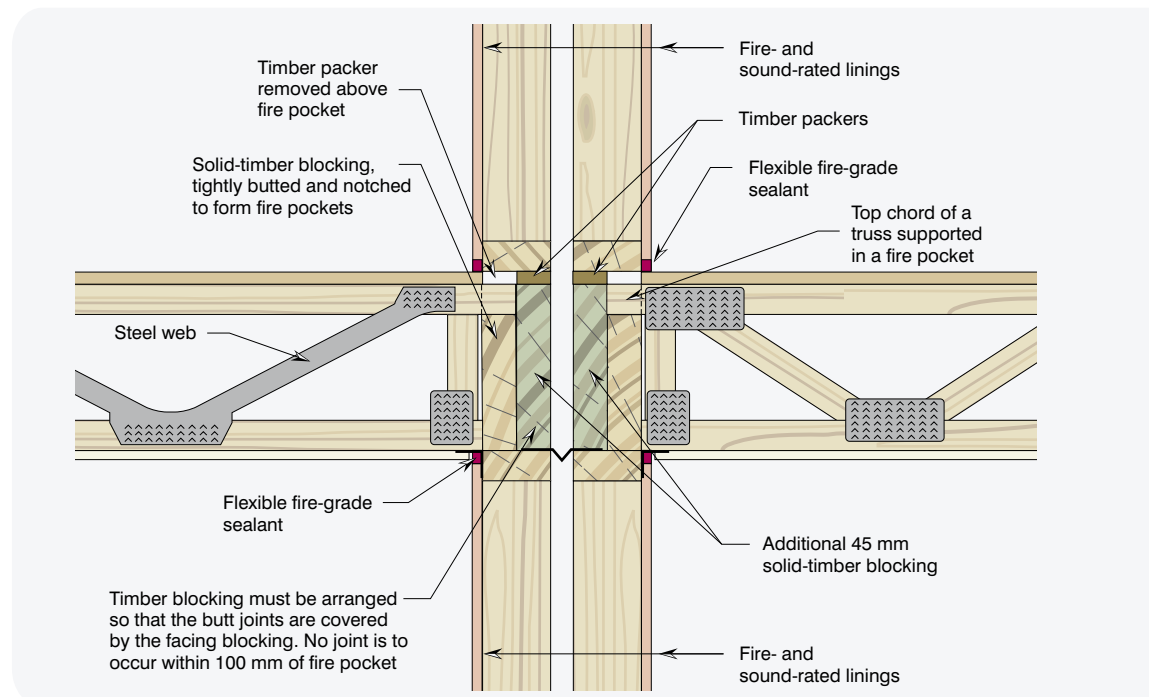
Floor-truss top chord supported in the pocket – FRL 60 minutes – elevation view.
